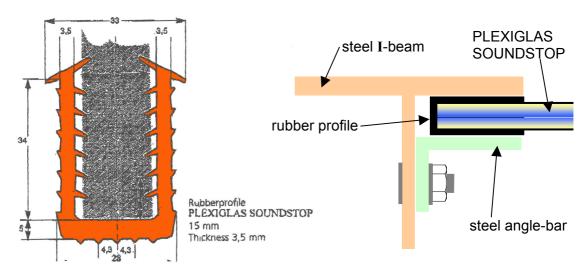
Dimensions of the rubber profile and schematic drawing of the clamping system
